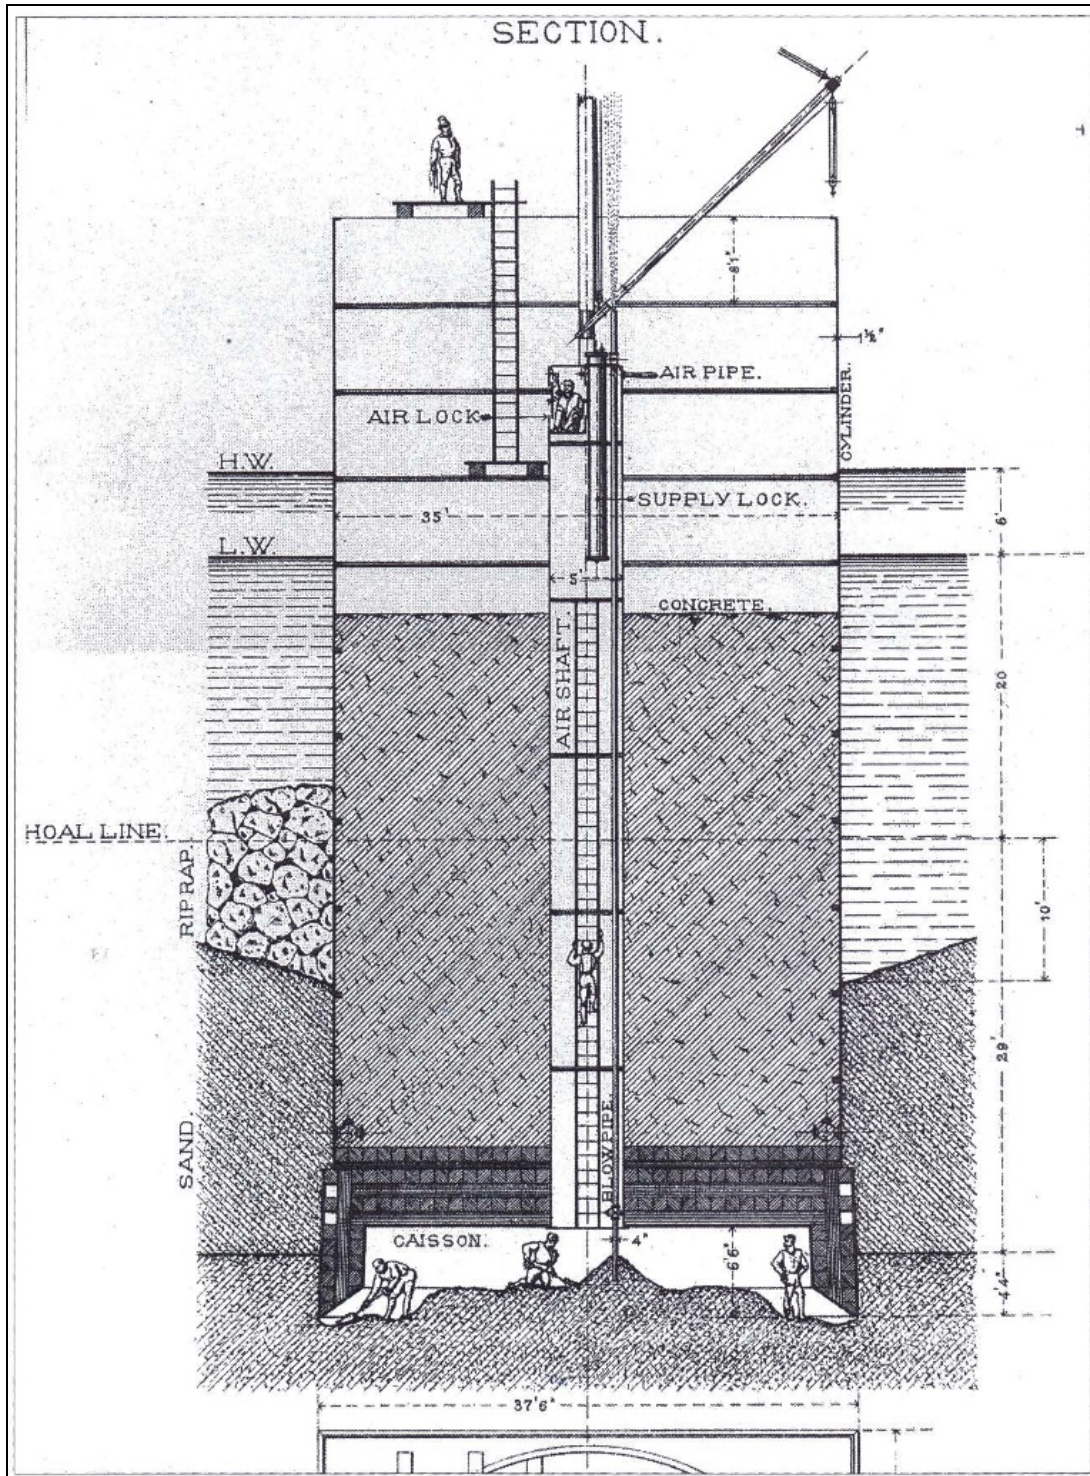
Caisson design, used in the Sabine Bank installation. The design allowed more secure foundation than traditional screw pile. (Courtesy of USCG.)
